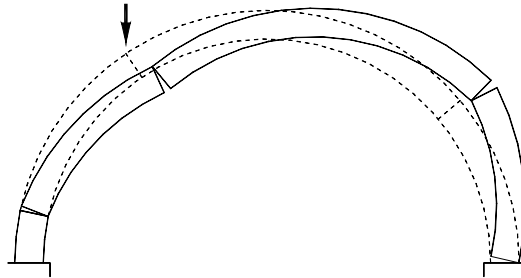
Four-hinge failure mechanism of a semi-circular masonry arch submitted to an asymmetrical loading.
